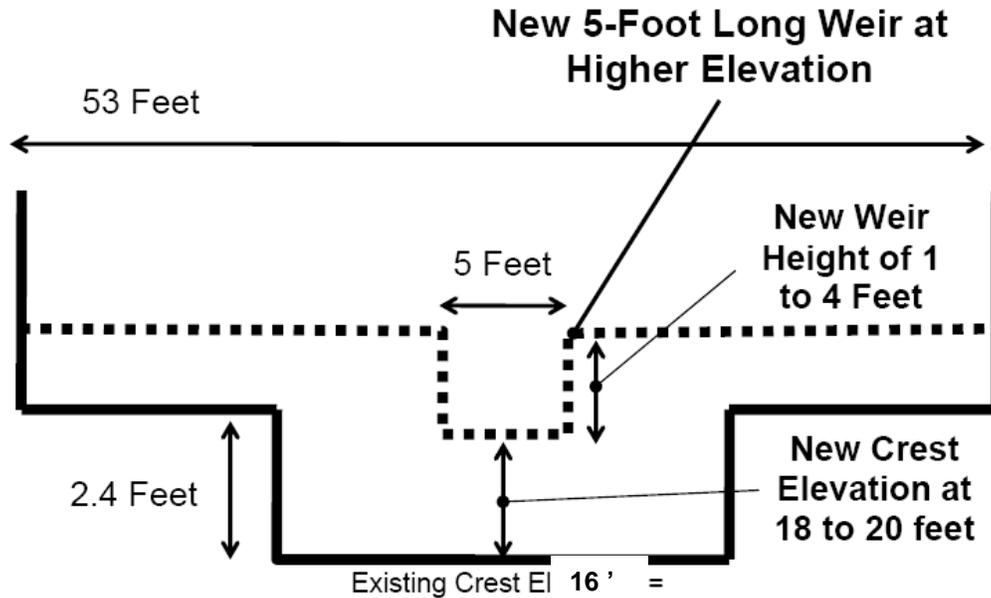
Lower Pond - Proposed Modification to Outlet Structure
